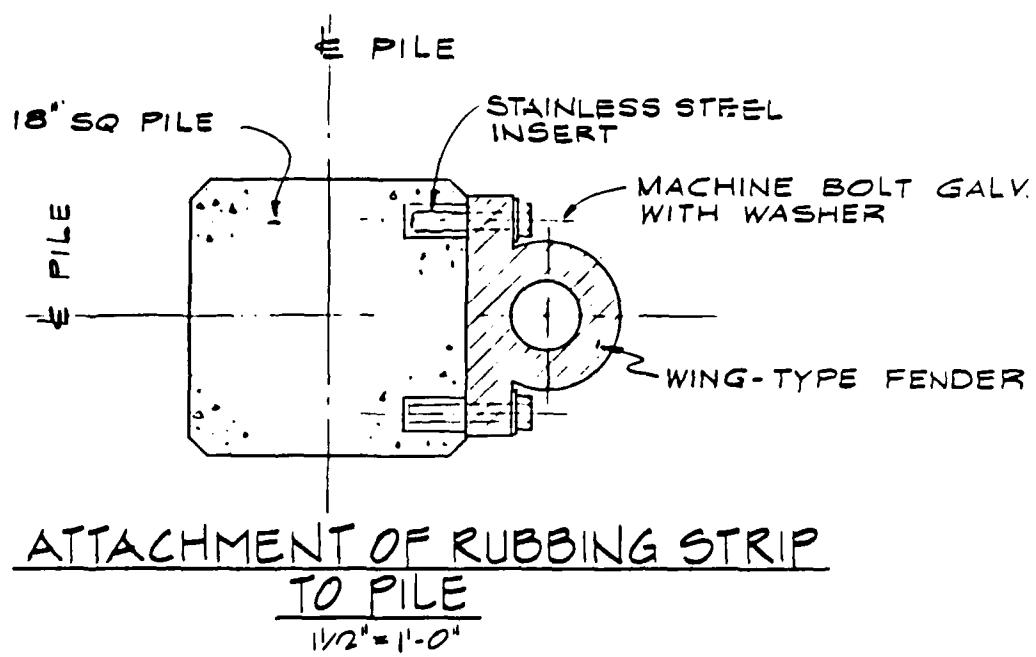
Fender System with Wing-Type Fender for Rubbing Strip
